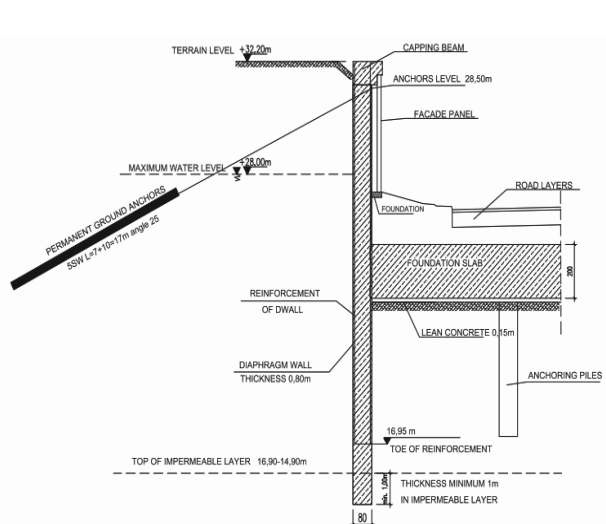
Typical cross-section of the excavation wall; 80cm thick diaphragm walls, anchored using permanent anchors.
